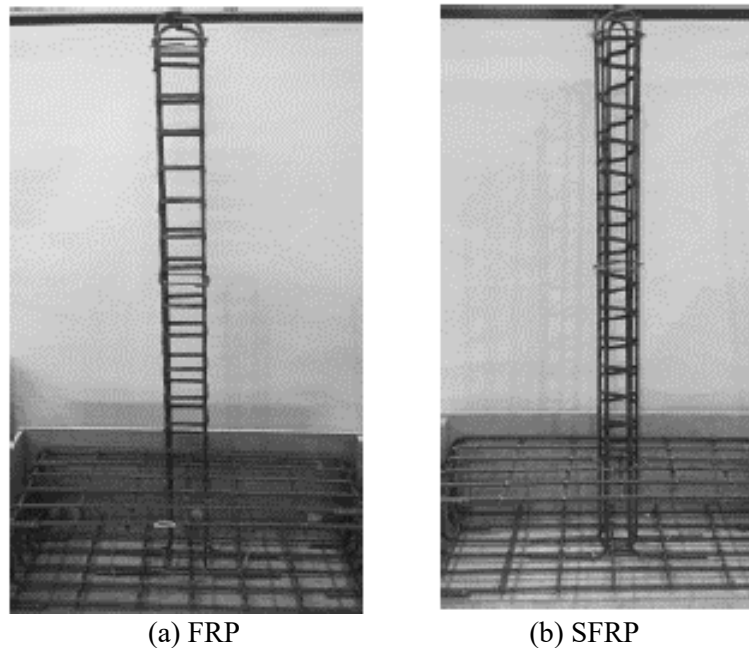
Arrangements of longitudinal rebar and transverse reinforcements of columns with CFRP strips
